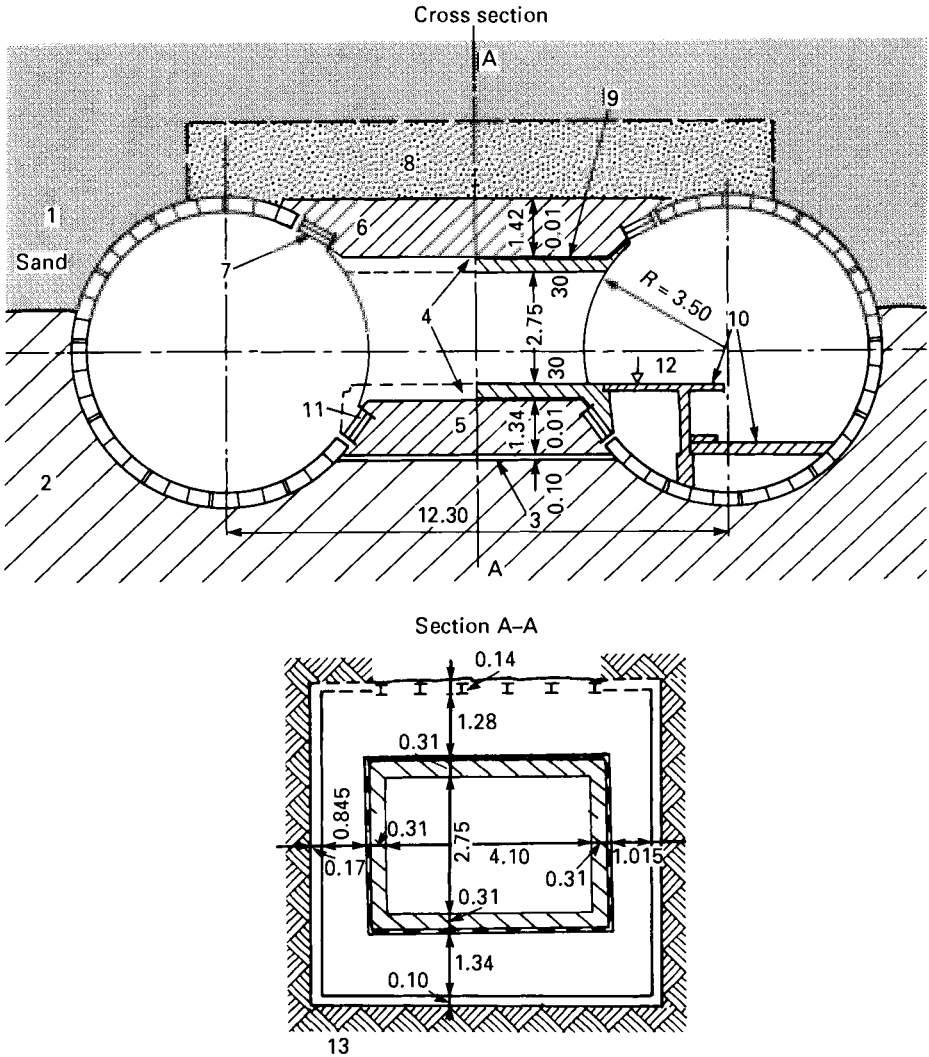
Station with single tunnels (Munich). 1, Platform level; 2, track centreline; 3, tunnel construction; 4, cast-*in-situ* RC lining; 5, bituminous waterproofing; 6, 3 cm gunite layer; 7, joint; 8, 3–10 cm protecting concrete layer; 9, dimensions (m)
